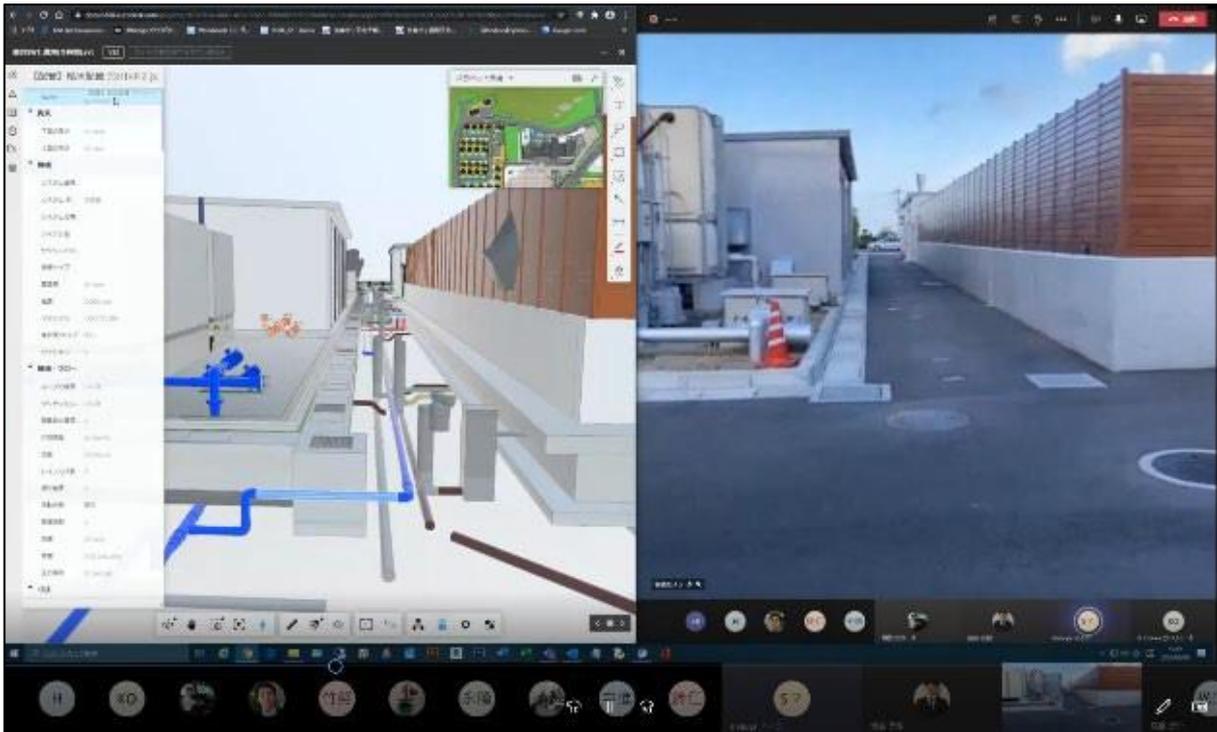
Remote Collaboration Using 3D Models to Share Attributes and Pipe Connections of Underground Installations Difficult to Inspect On-Site
